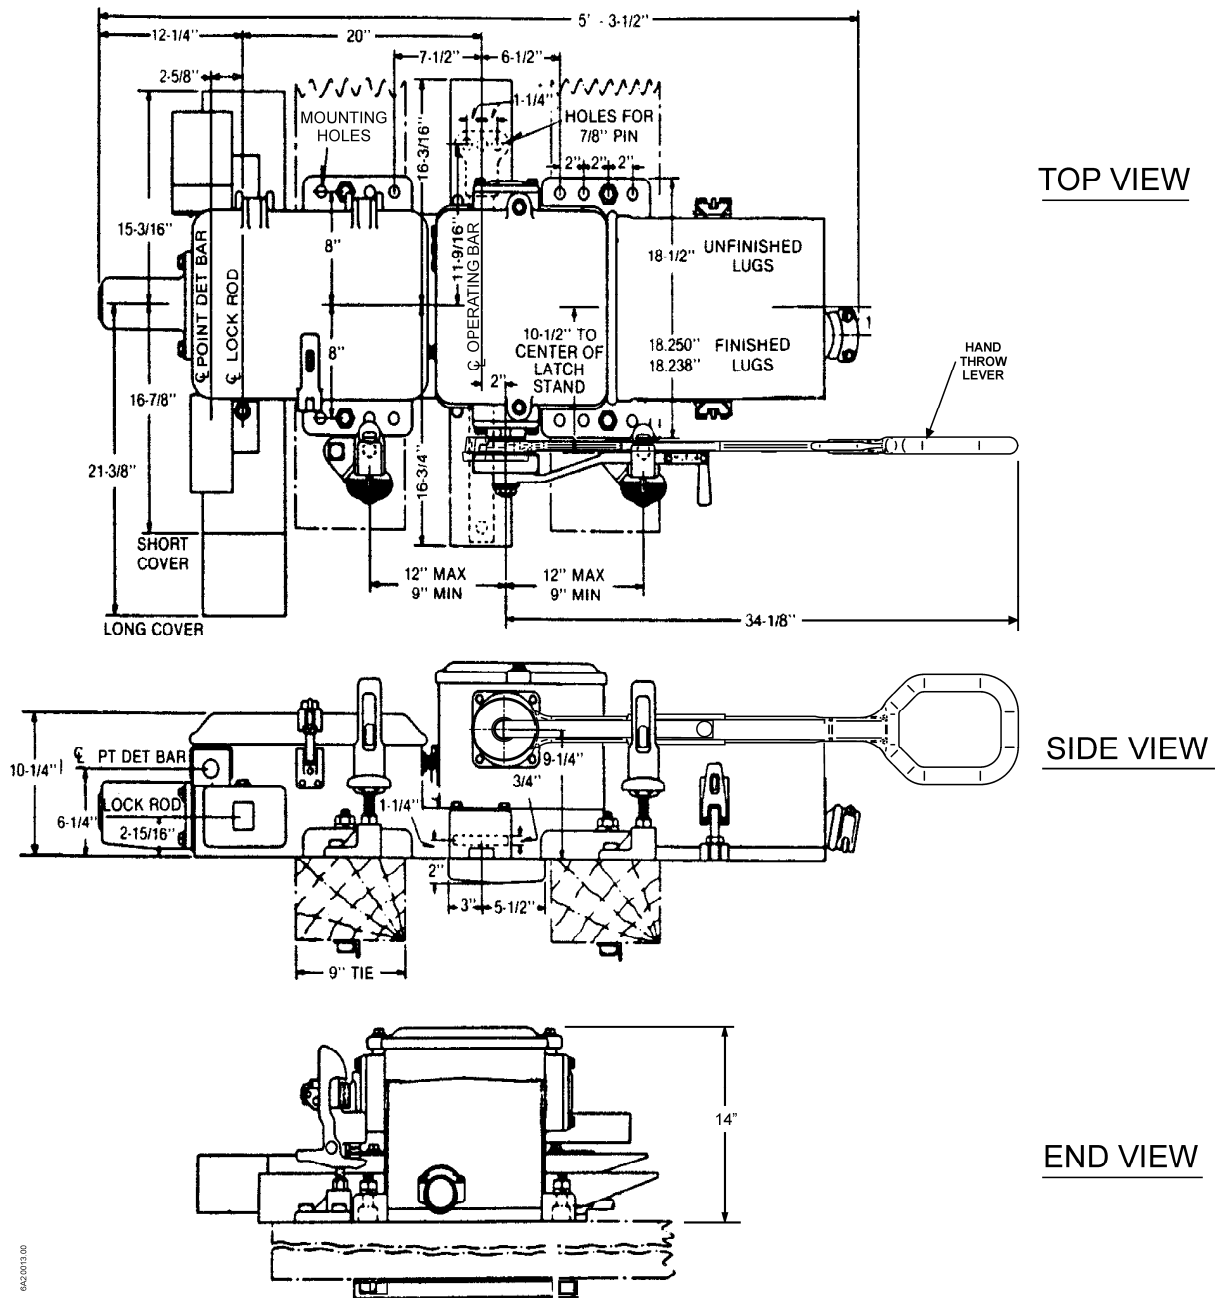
M-23 Switch Machine Typical Mounting Plan
